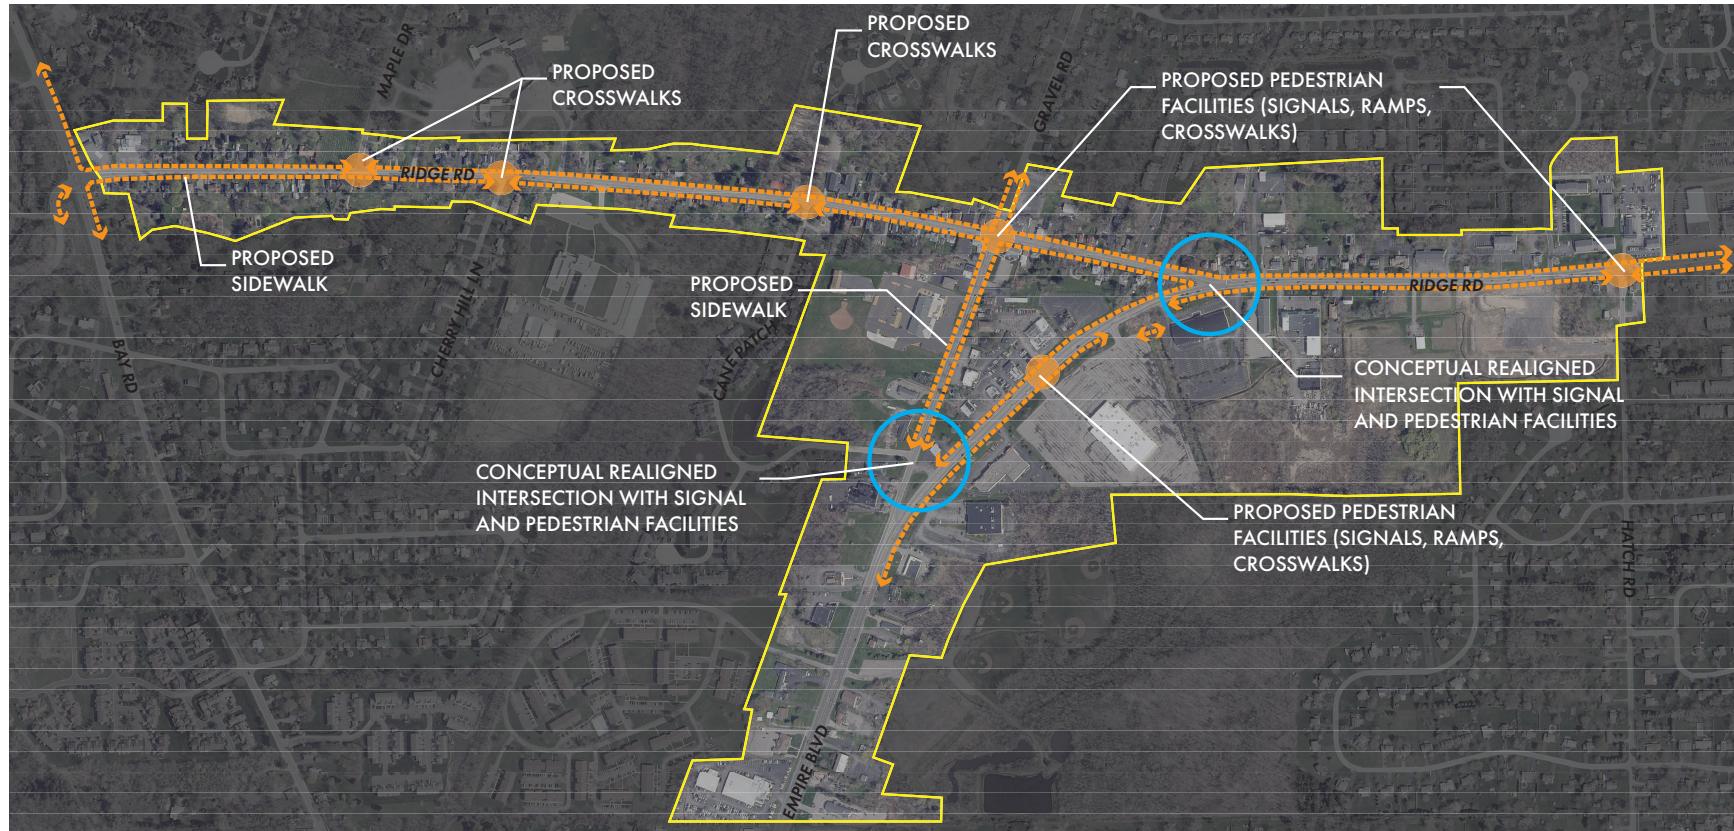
Conceptual Sidewalk and Crossing Plan; Source: Passero Associates
